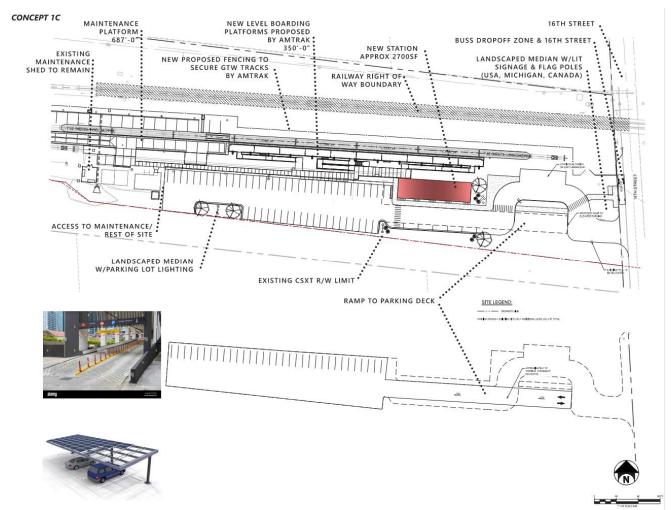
Option 1C Conceptual Plan (Dismissed from Further Consideration) 3.6 BUILD OPTION 1C (EXISTING SITE WITH PARKING DECK)
